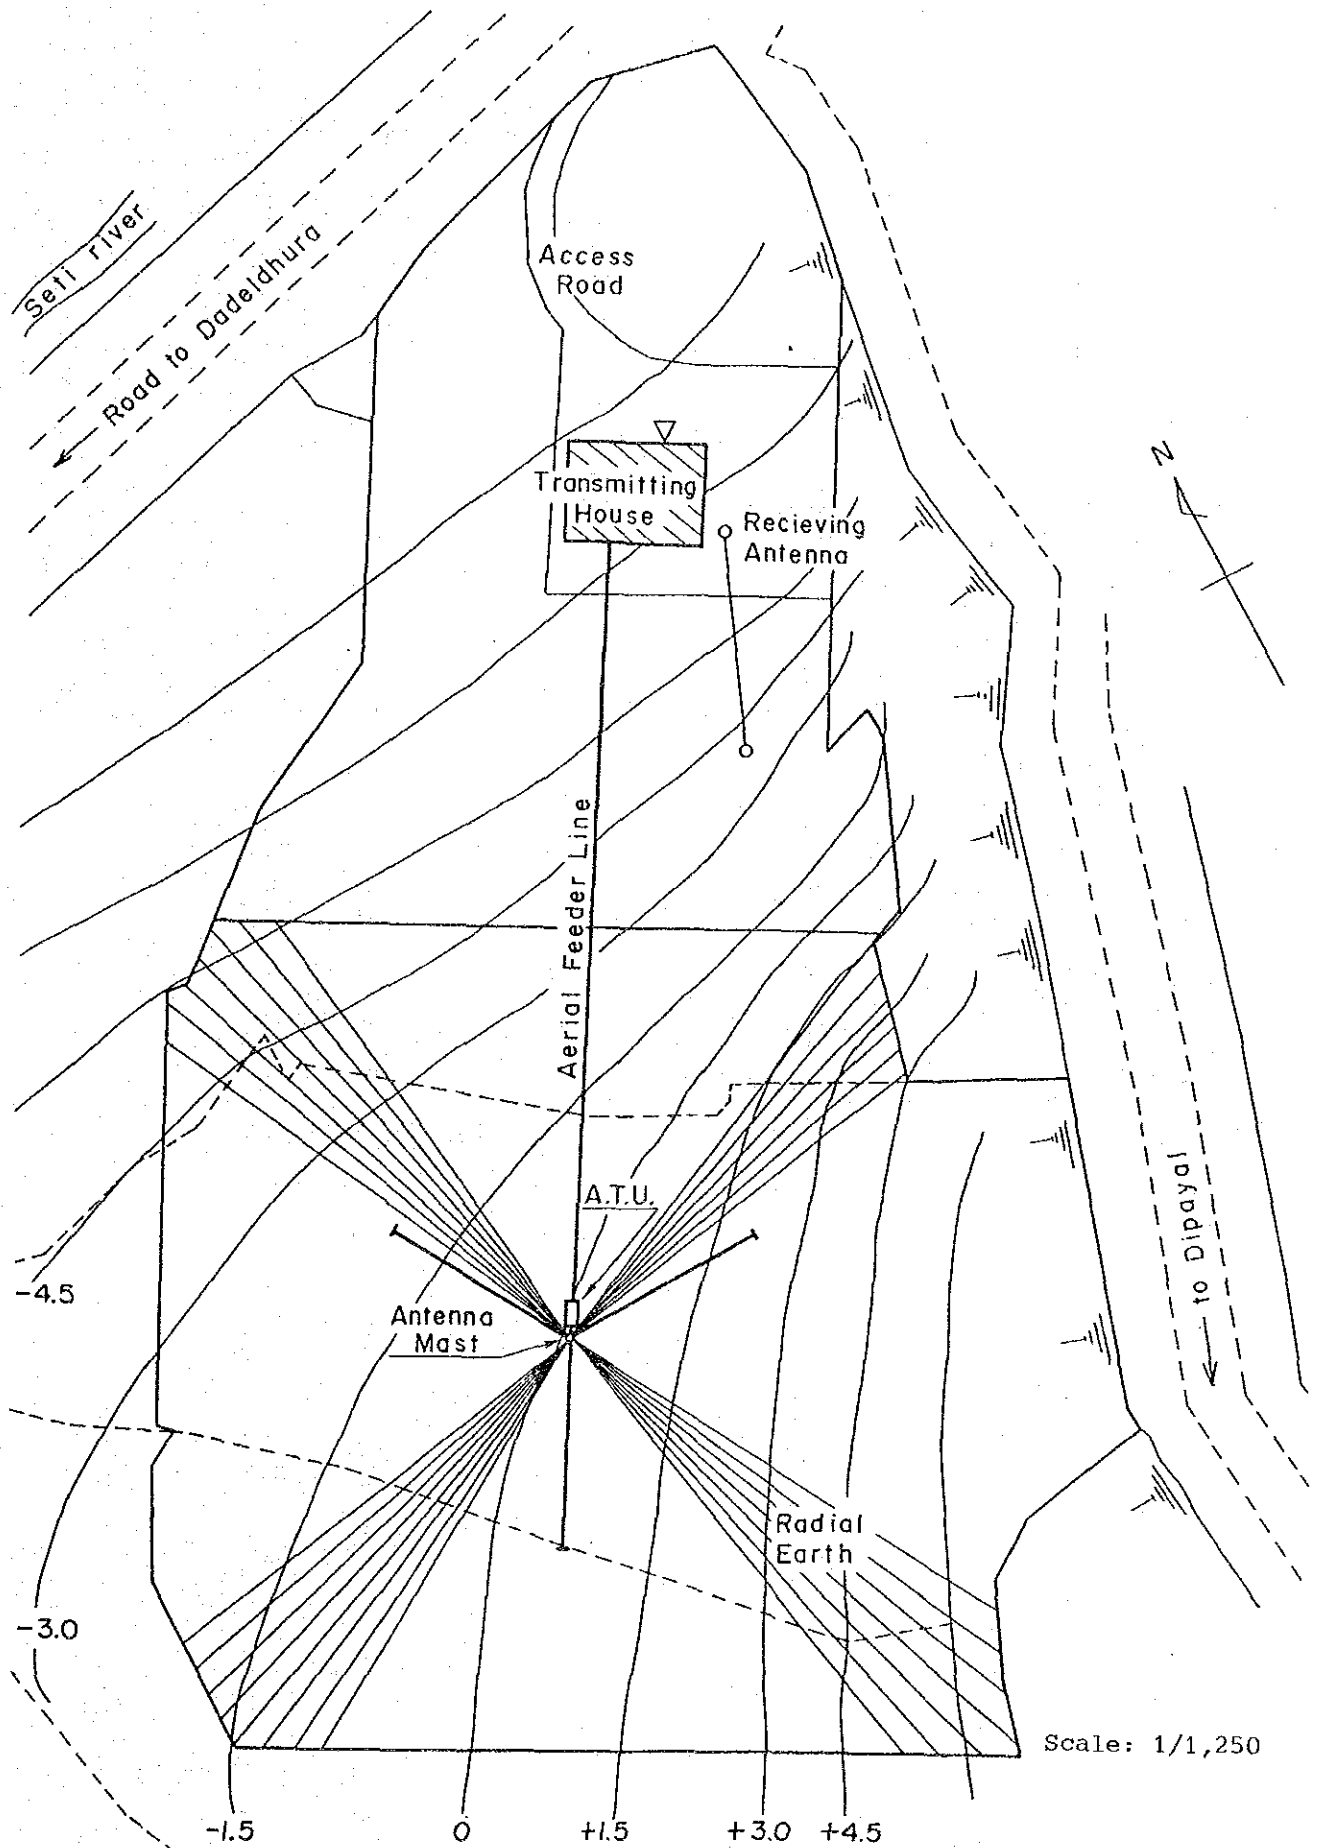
Dipayal Broadcasting Station; Site Plan
